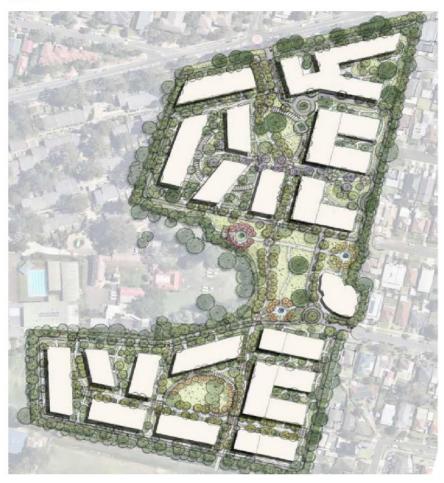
Indicative concept landscape scheme (Source: Site Image Landscape Architects)
